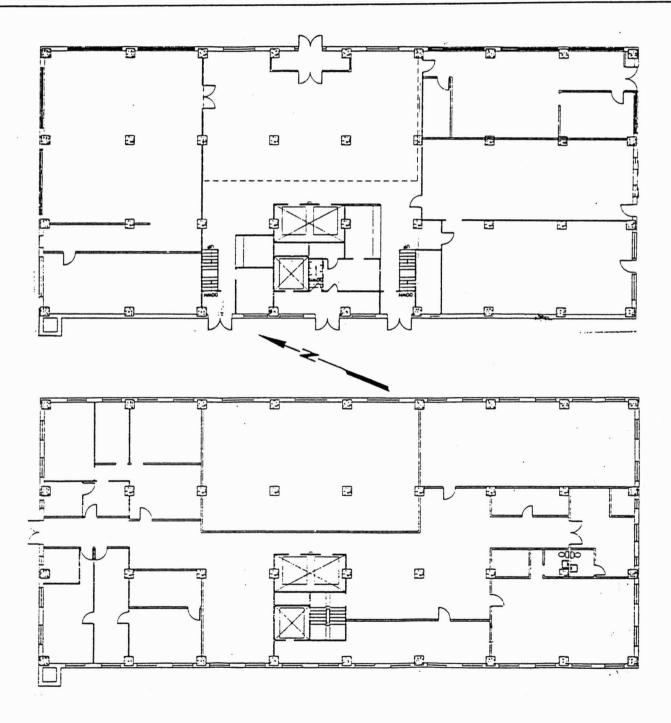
Current (1993) floor plans of lobby (top plan) and mezzanine levels (bottom plan), LeClaire Hotel.
